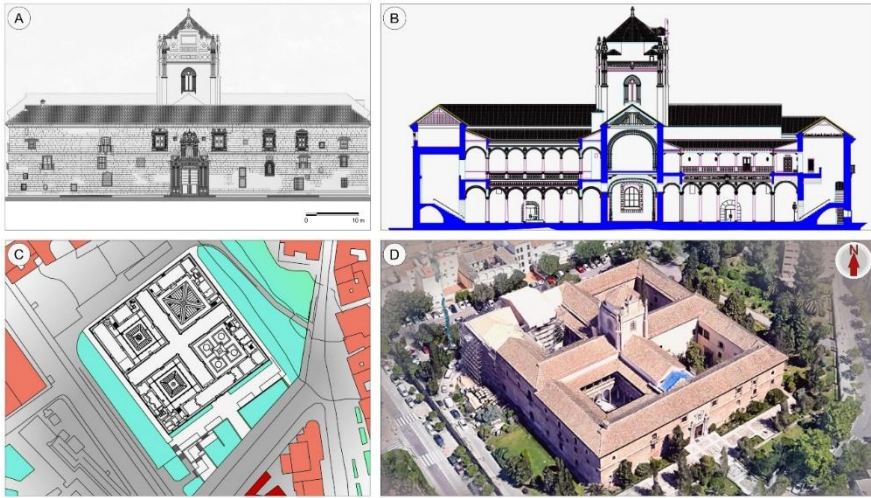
Elevation plan (a), section plan (b), floor plan (c) and aerial view (d) of the Royal Hospital of Granada building
